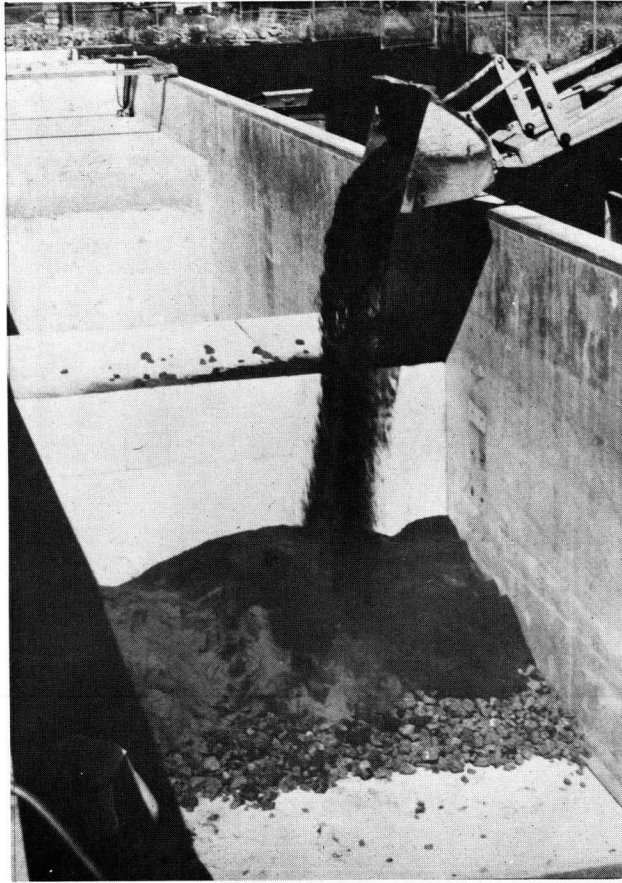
Caisson, Foundation Blanket and Placement of Sand Core, 1:10 Scale Model
